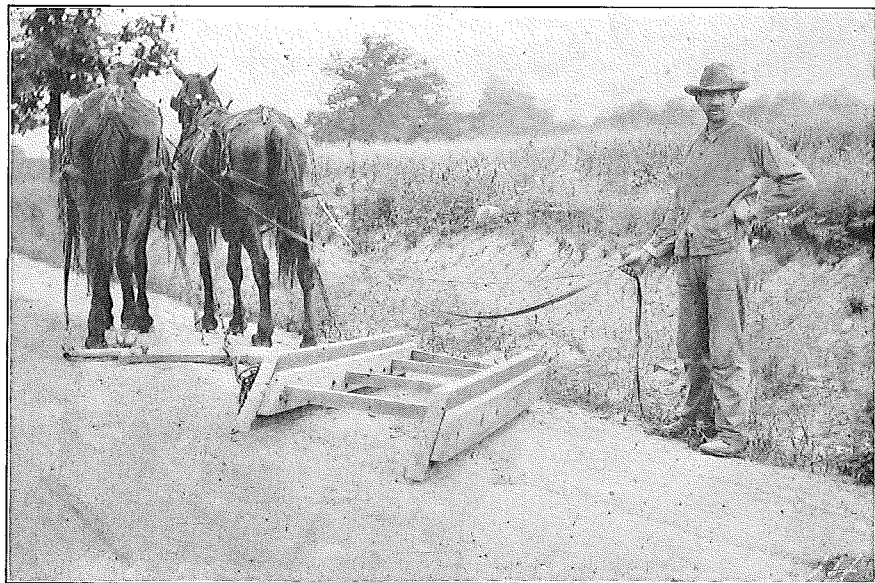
Oak plank drag used on Experimental Earth Road west of Ravenna, Ohio.
